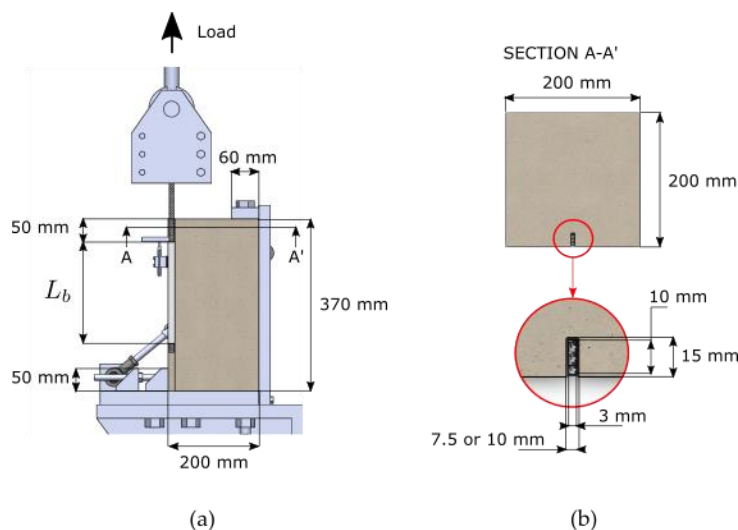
(a) lateral view of the setup and (b) detailed view of the groove dimensions and CFRP strip position.
